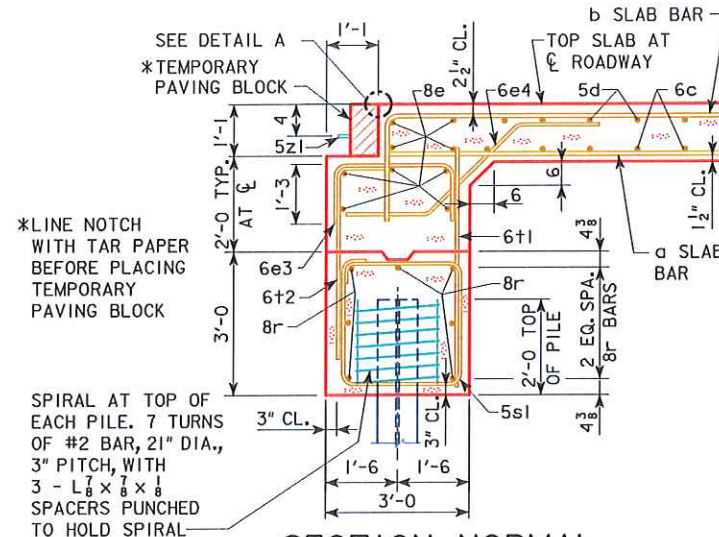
DETAILS ON THIS SHEET ARE TO BE USED ONLY WHEN ABUTMENTS ARE PLACED ON STEEL PILES. IF ROCK IS ENCOUNTERED CLOSER THAN 12'-0 BELOW ABUTMENT FOOTING, SPECIAL ANALYSIS MAY BE REQUIRED.
